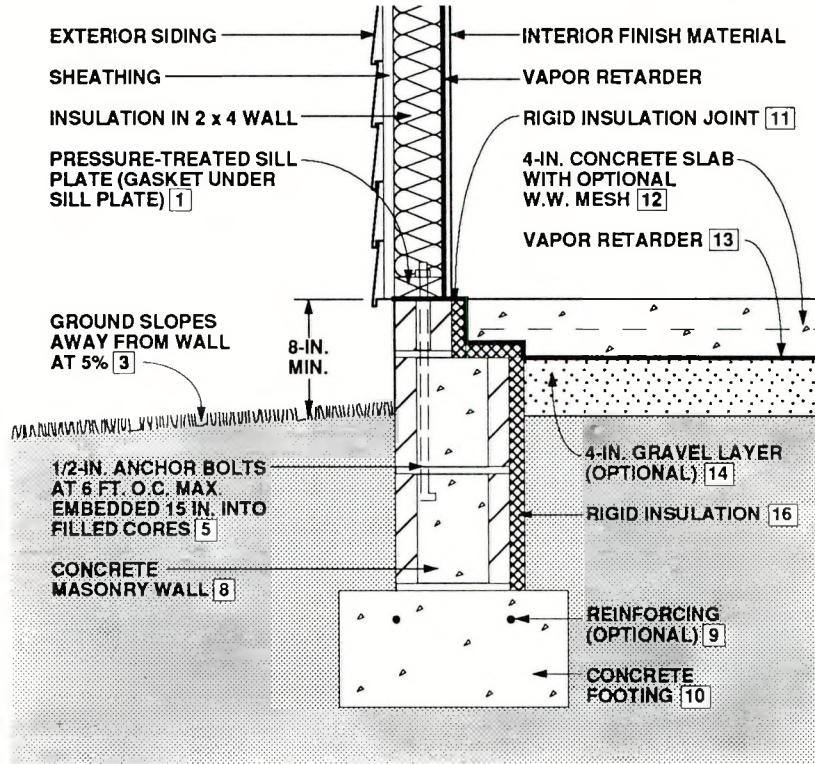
Slab-on-Grade with Masonry Wall (Interior Insulation)
